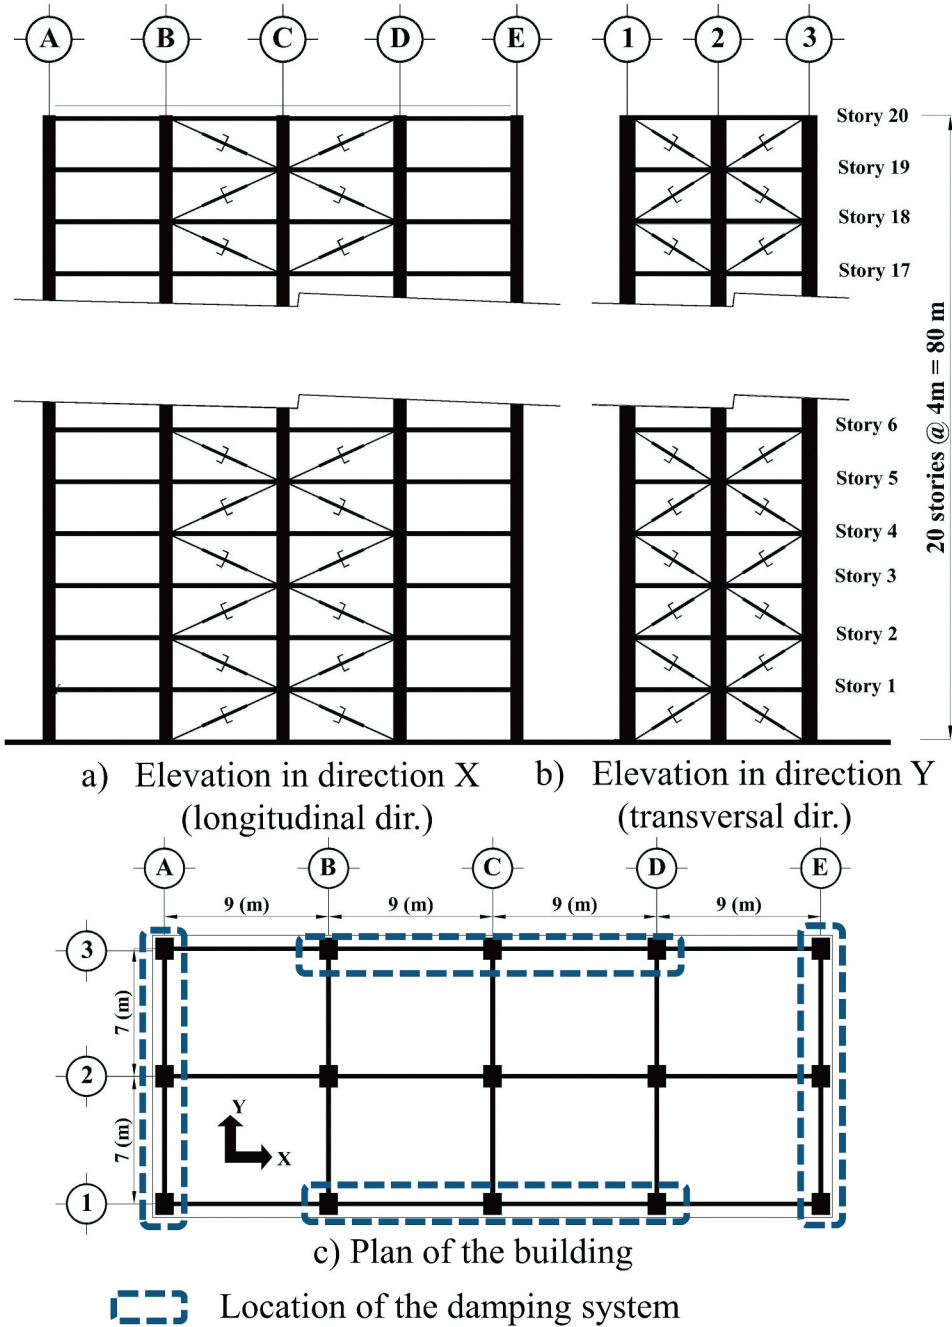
Geometric characteristics of the building of example 2: a) elevation in longitudinal direction, b) elevation in transversal direction, and c) location and configuration of damping system. Diagonal members represent viscous dampers.
